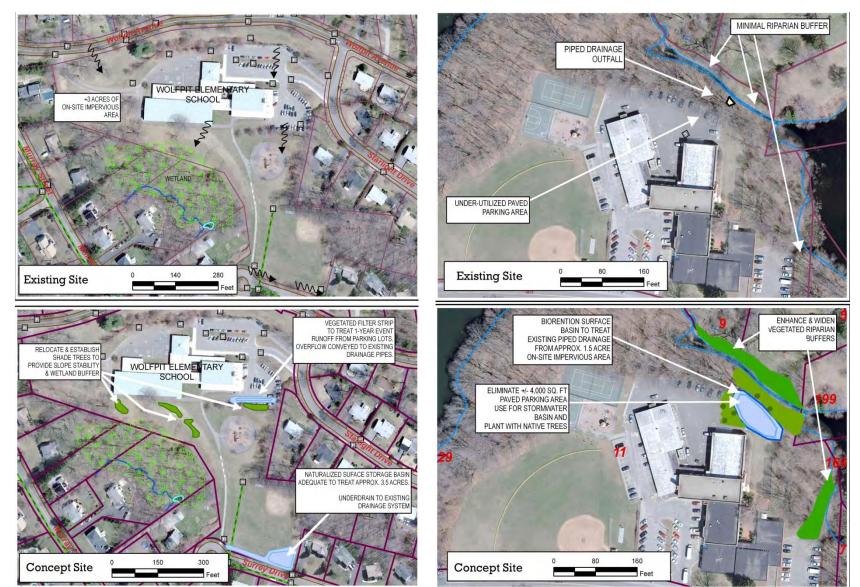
Concept Plan for Wolf Pit Elementary School
